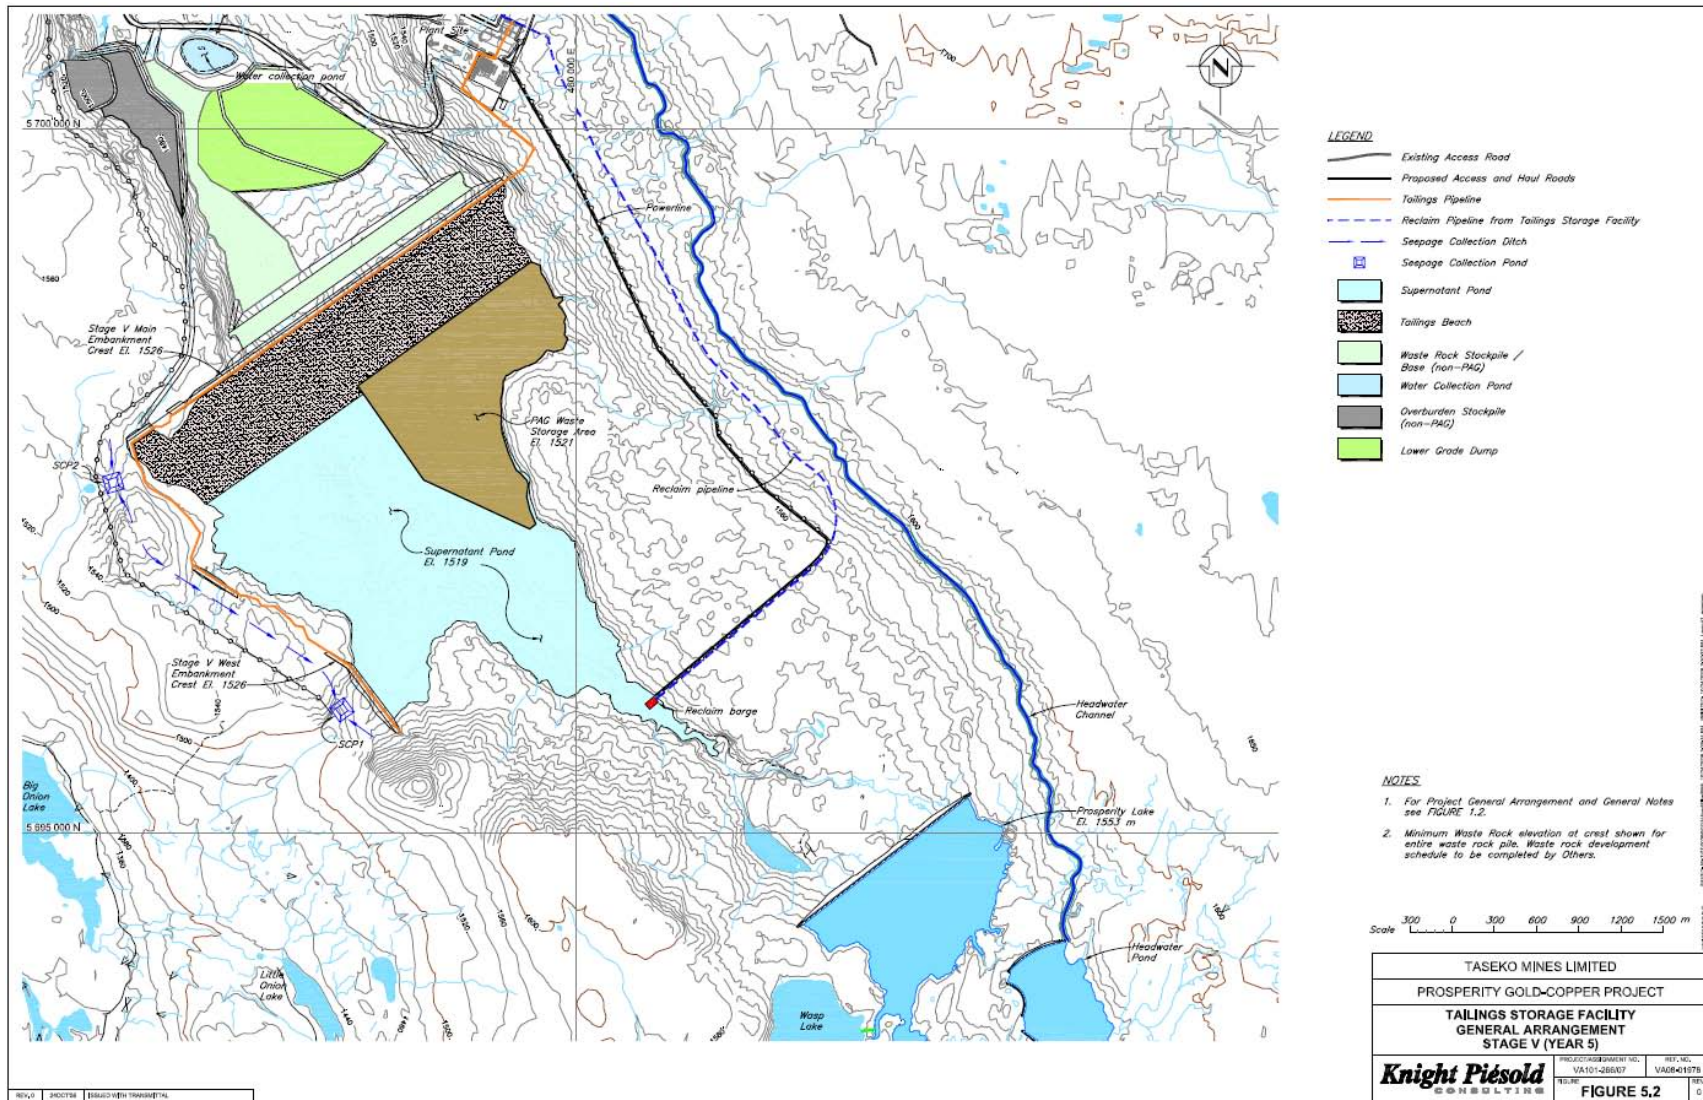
Tailings Storage Facility General Arrangement–Stage V (Year 5)
